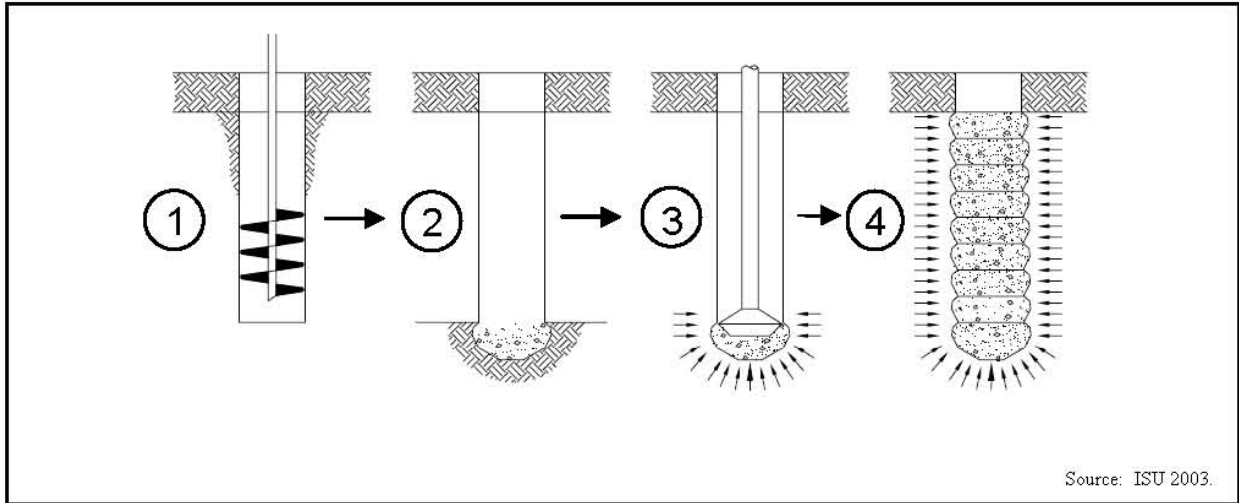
Illustration of a rammed aggregate pier construction process: (1) drill cavity, (2) place stone, (3) ram stone to form bottom bulb, and (4) place and ram lifts to form undulated-sided shaft.
